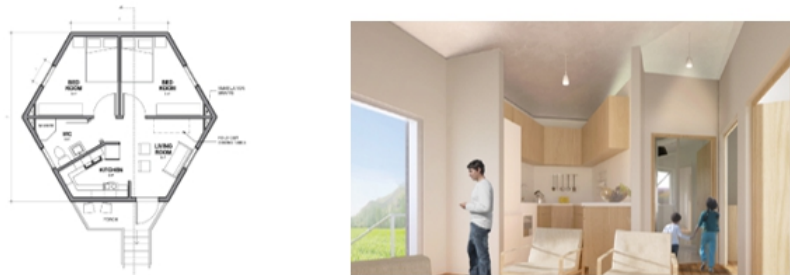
and b: Hex House floor plan and living room/kitchen interior.
